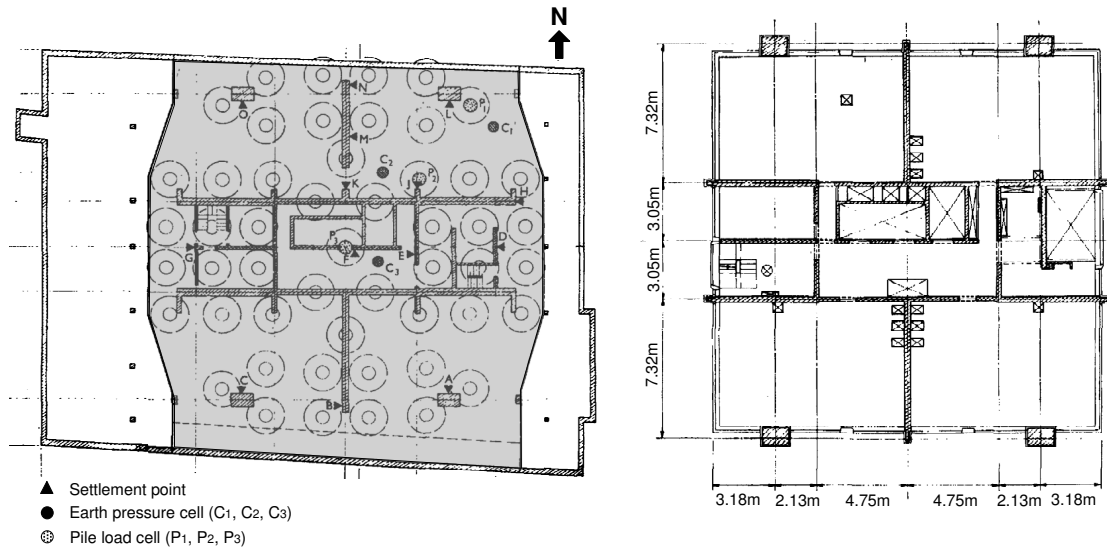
Foundation and superstructure layout of Hyde Park Cavalry Barracks (Hooper 1973)
